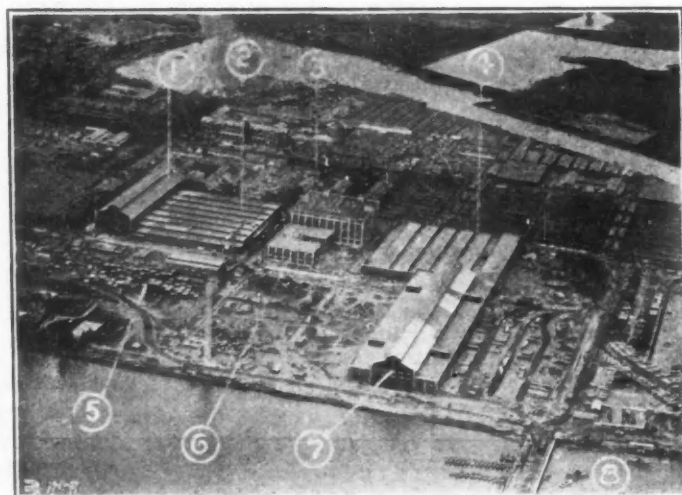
AIRPLANE VIEW OF THE FACTORY TODAY, SHOWING BOTH THE ORIGINAL AND ENLARGED PLANT
